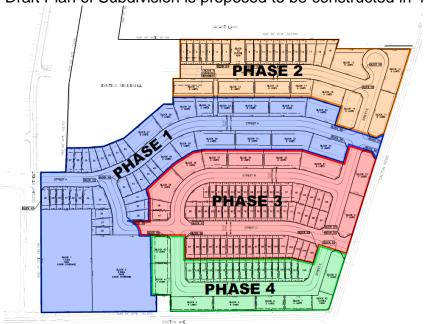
Proposed phasing plan for the Draft Plan of Subdivision.
